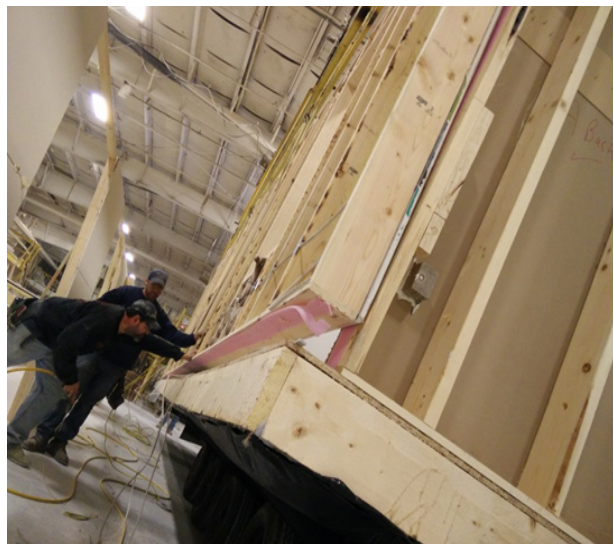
Wall section is installed with foam gasket along bottom edge/end of adjoining wall
